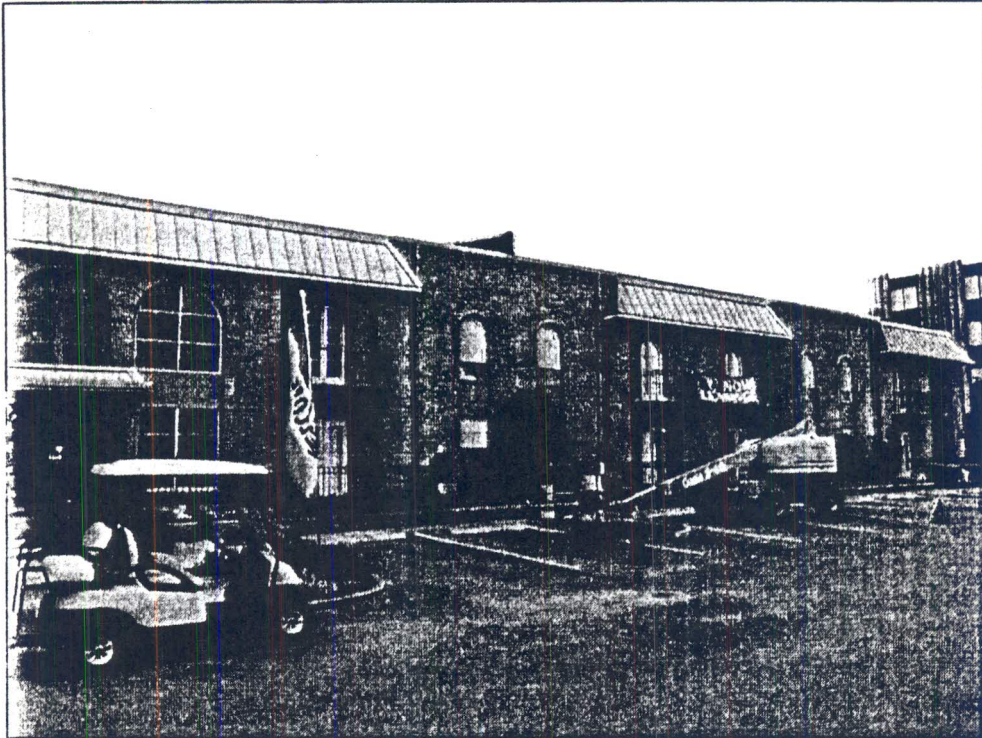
VIEW OF BUILDING #1 OF THE BEL AIR APARTMENT COMPLEX.
